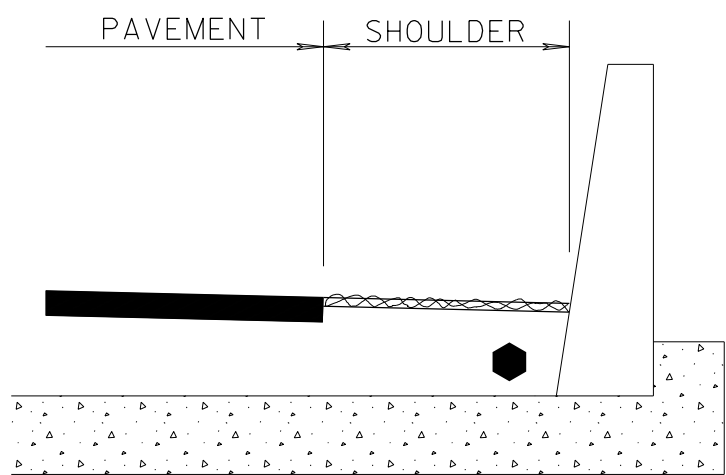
DETAIL FOR APPROACH END OF BARRIER FOR ONE WAY AND TWO WAY TRAFFIC
